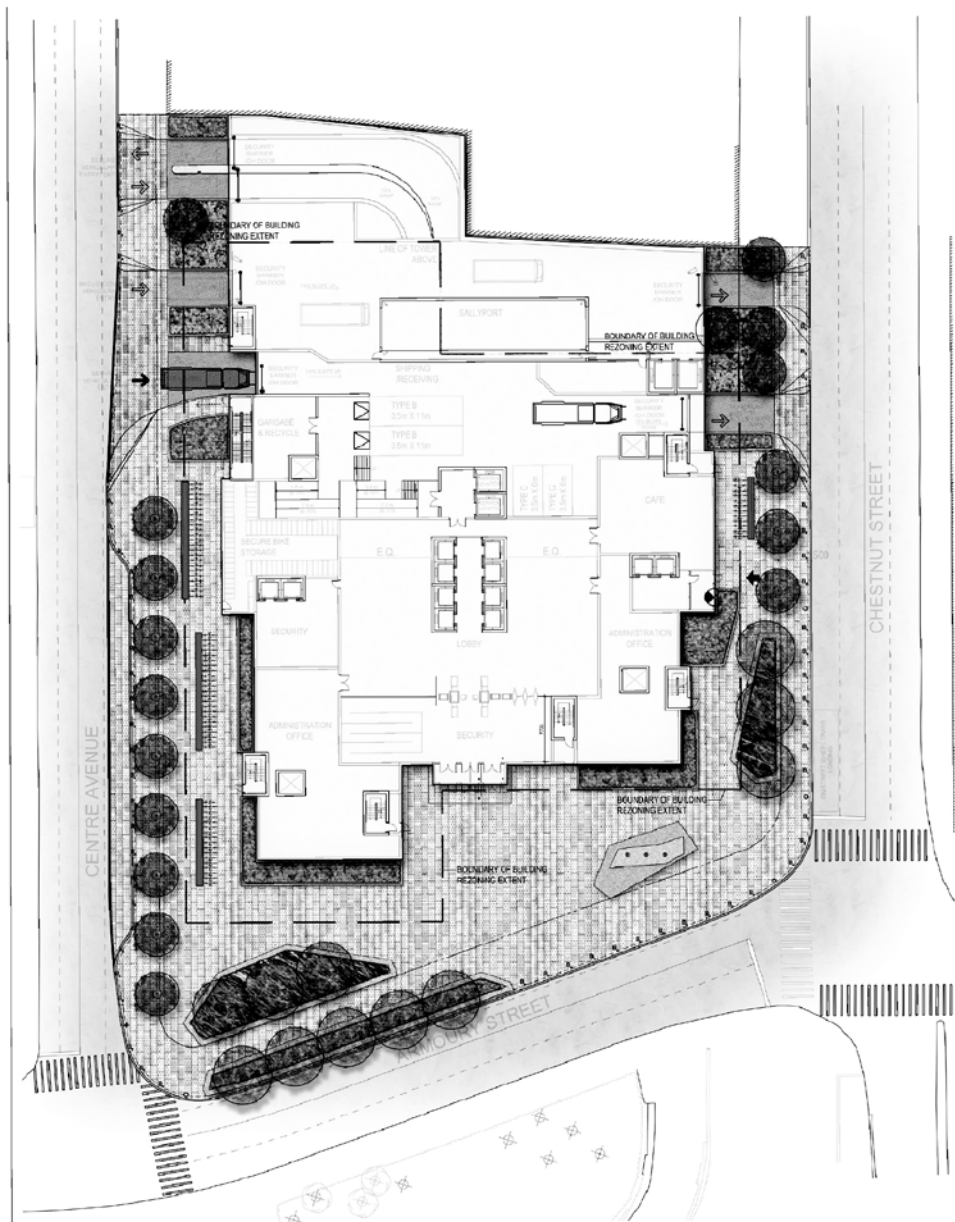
Conceptual Landscape Plan Source: MBTW
